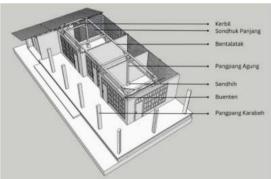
Modern Madurese house building structure Source: Research team, 2023
